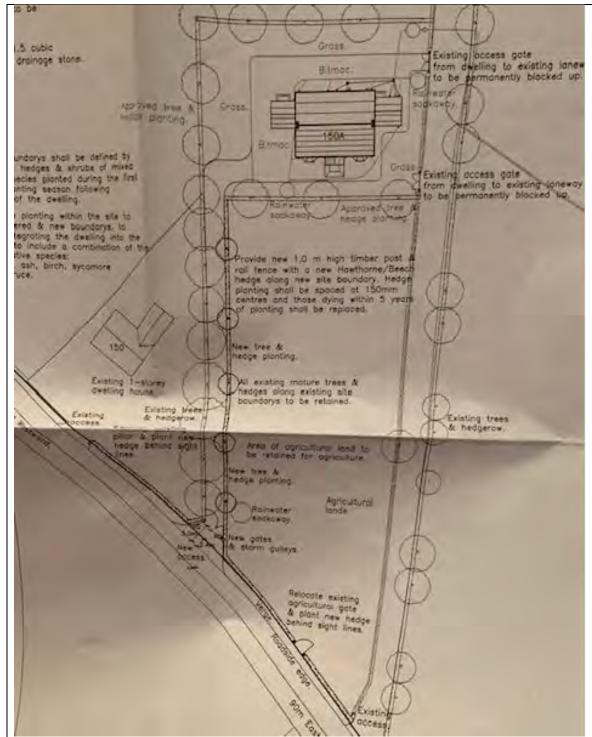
Block plan granted under planning application I/2007/0593/F showing land to front of dwelling to be retained for agriculture.
